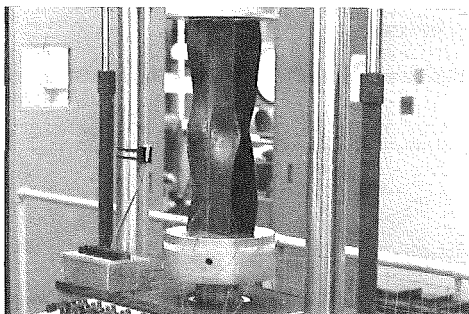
Failure of I-Shaped Stub Columns (Specimen 2D2A)
